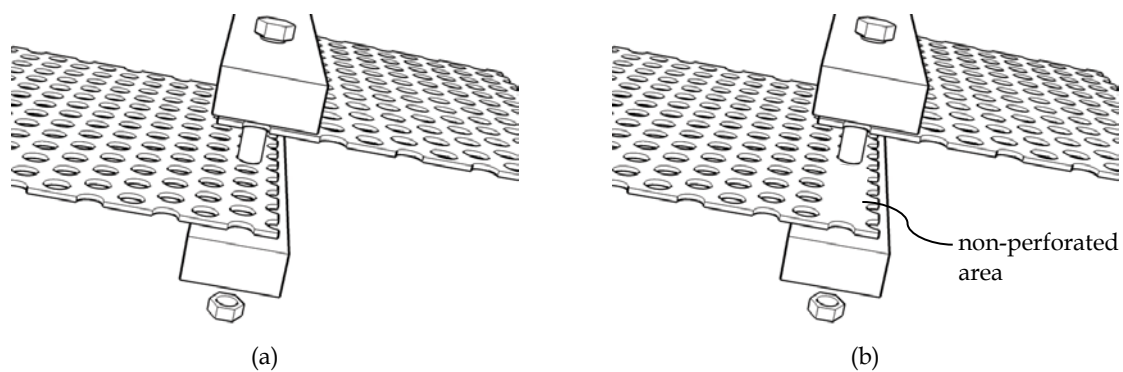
Mechanical joint of the connection using standard perforated plates (a) and customized perforated plates with a non-perforated area (b) to guarantee drilling tolerance.
